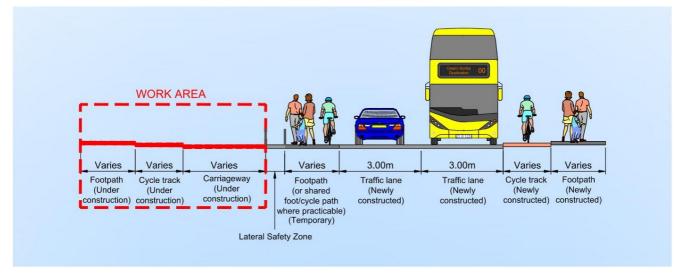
Traffic Management Cross Section, Section 4b – Stage 2
